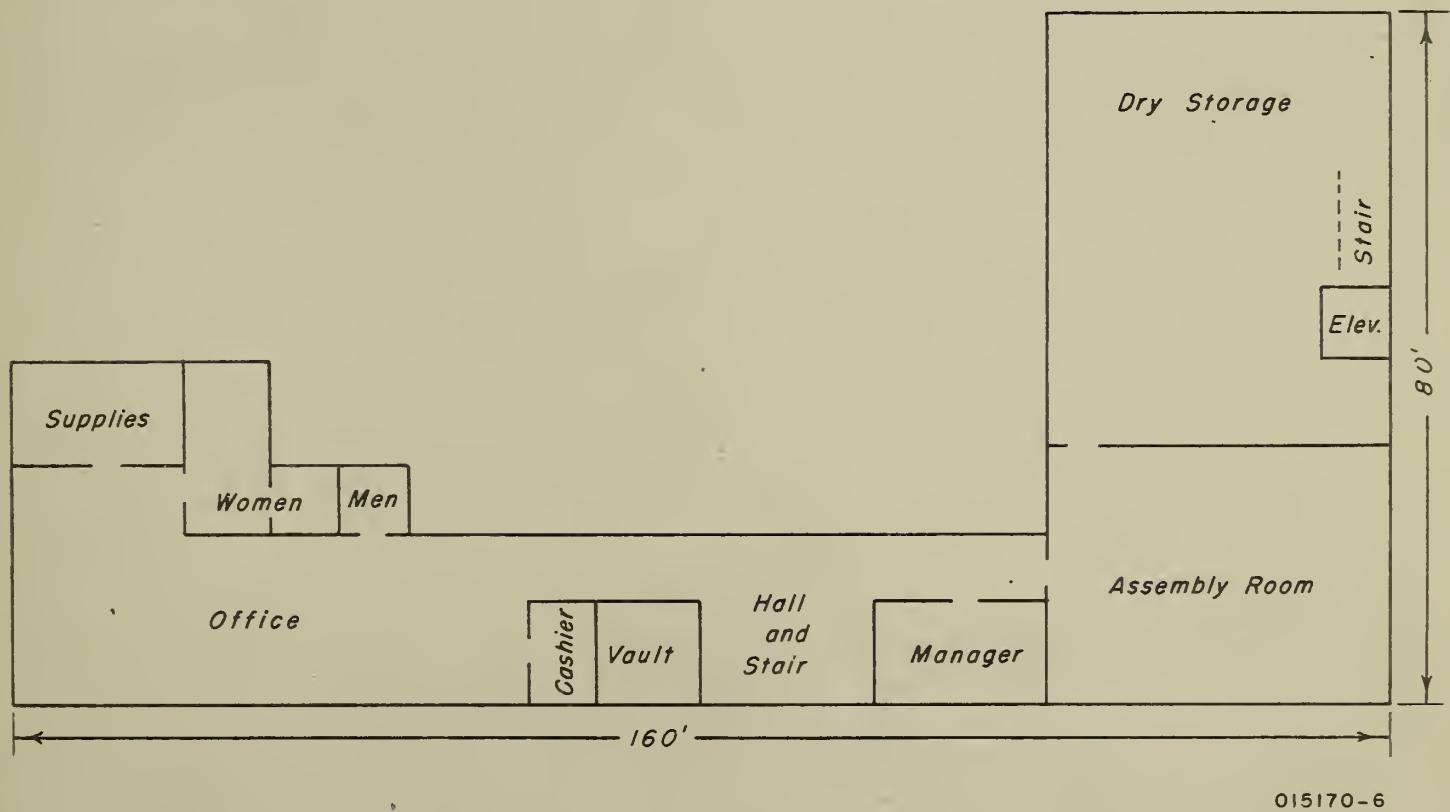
Suggested floor plan for milk-pasteurizing plant of 7,500 to 10,000 gallons capacity. (Second floor.)
